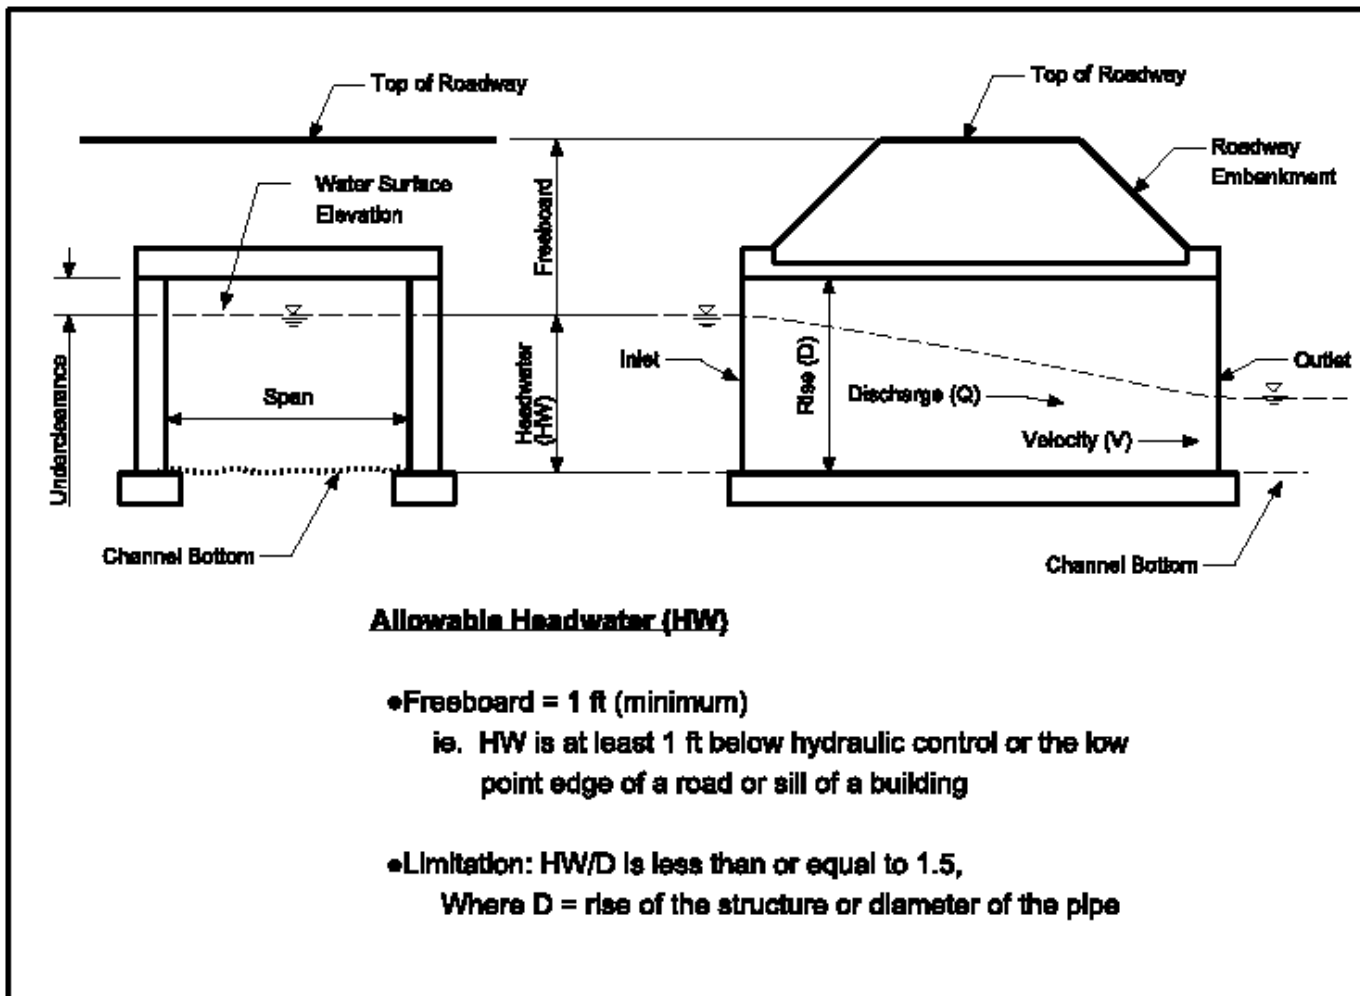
Culvert Hydraulic Design Criteria Terminology
